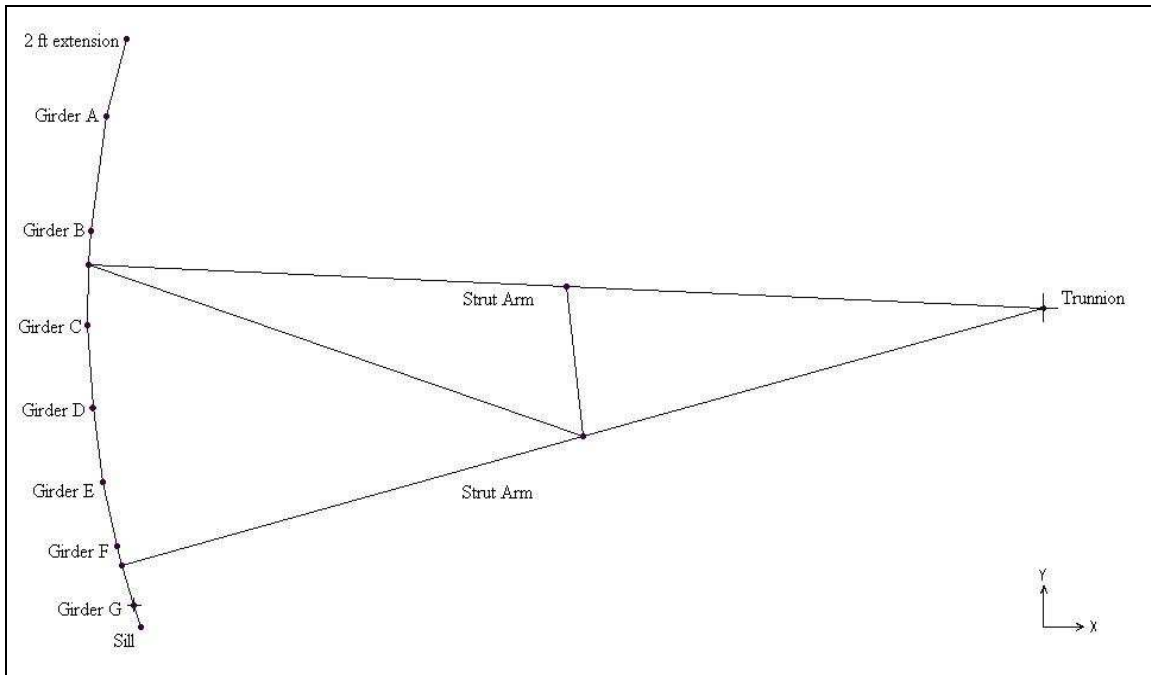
General Layout of Existing Tainter Gate with 2.5-Foot Extension
